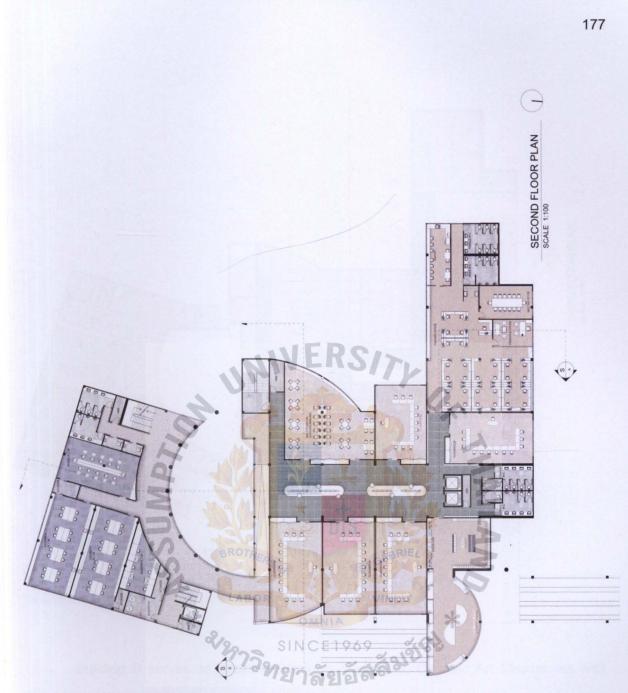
SECOND FLOOR FURNITURE LAYOUT PLAN
